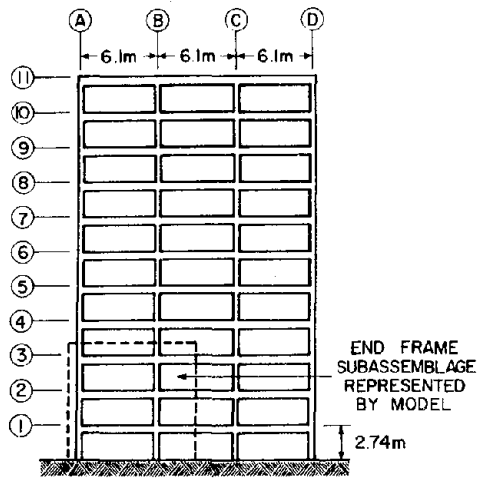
END FRAME ELEVATION - PROTOTYPE
